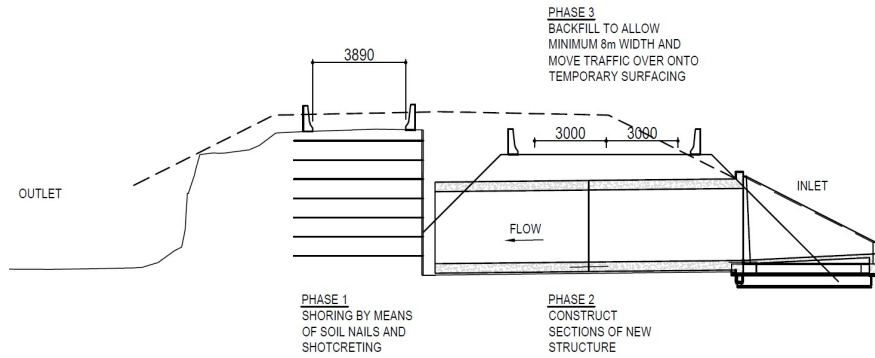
Construction Stage 1: Single Lane Stop-Go safety measures for existing road on left hand side. New culvert construction with dual traffic at first lift on right hand side.
